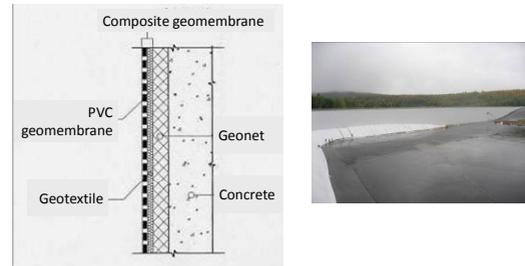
At Waldeck gravity dam in Germany, 2008, the composite geomembrane is placed on a drainage geonet.
